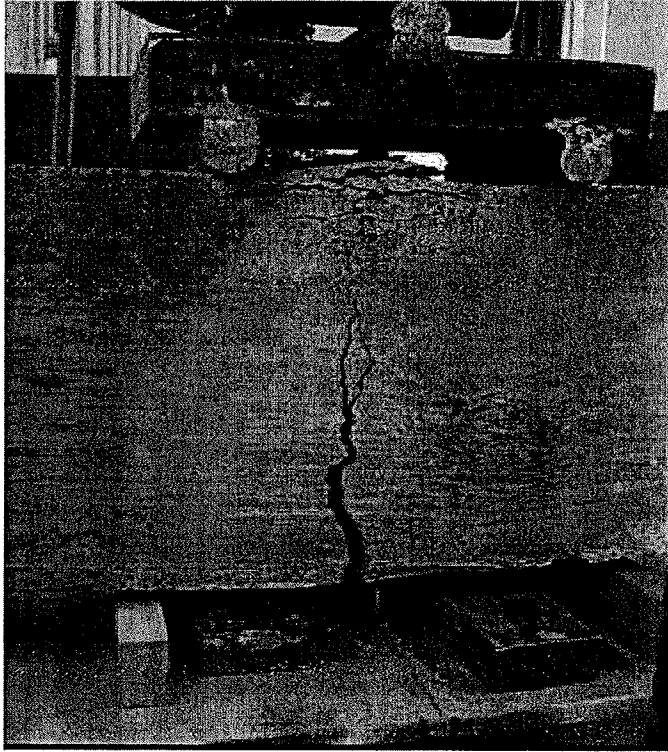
View of the flexural crack in the BRC -4 beam.
